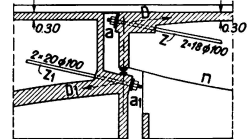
Pre-stressed continuous hinged girder bridge.
